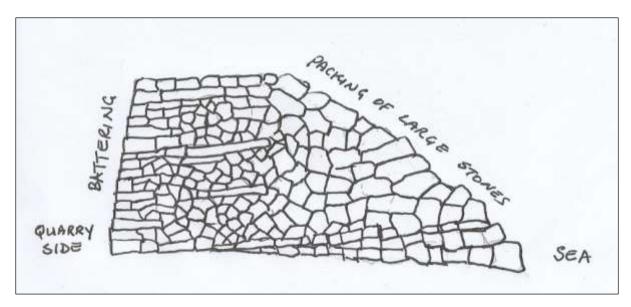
Cross-sectional drawing shows the proposed structural design of the wall. (i) Battering is the leaning inwards of the wall which has the effect of lowering the centre of gravity in the wall. (ii) Careful stacking of stones that make the façade facing the quarry (left), (ii) Core of the wall has occasional transversely laid tie stones (iii) In the defensive skin (right) facing the sea, large blocks are laid with size increasing from the centre of the wall as we move towards the sea façade.
